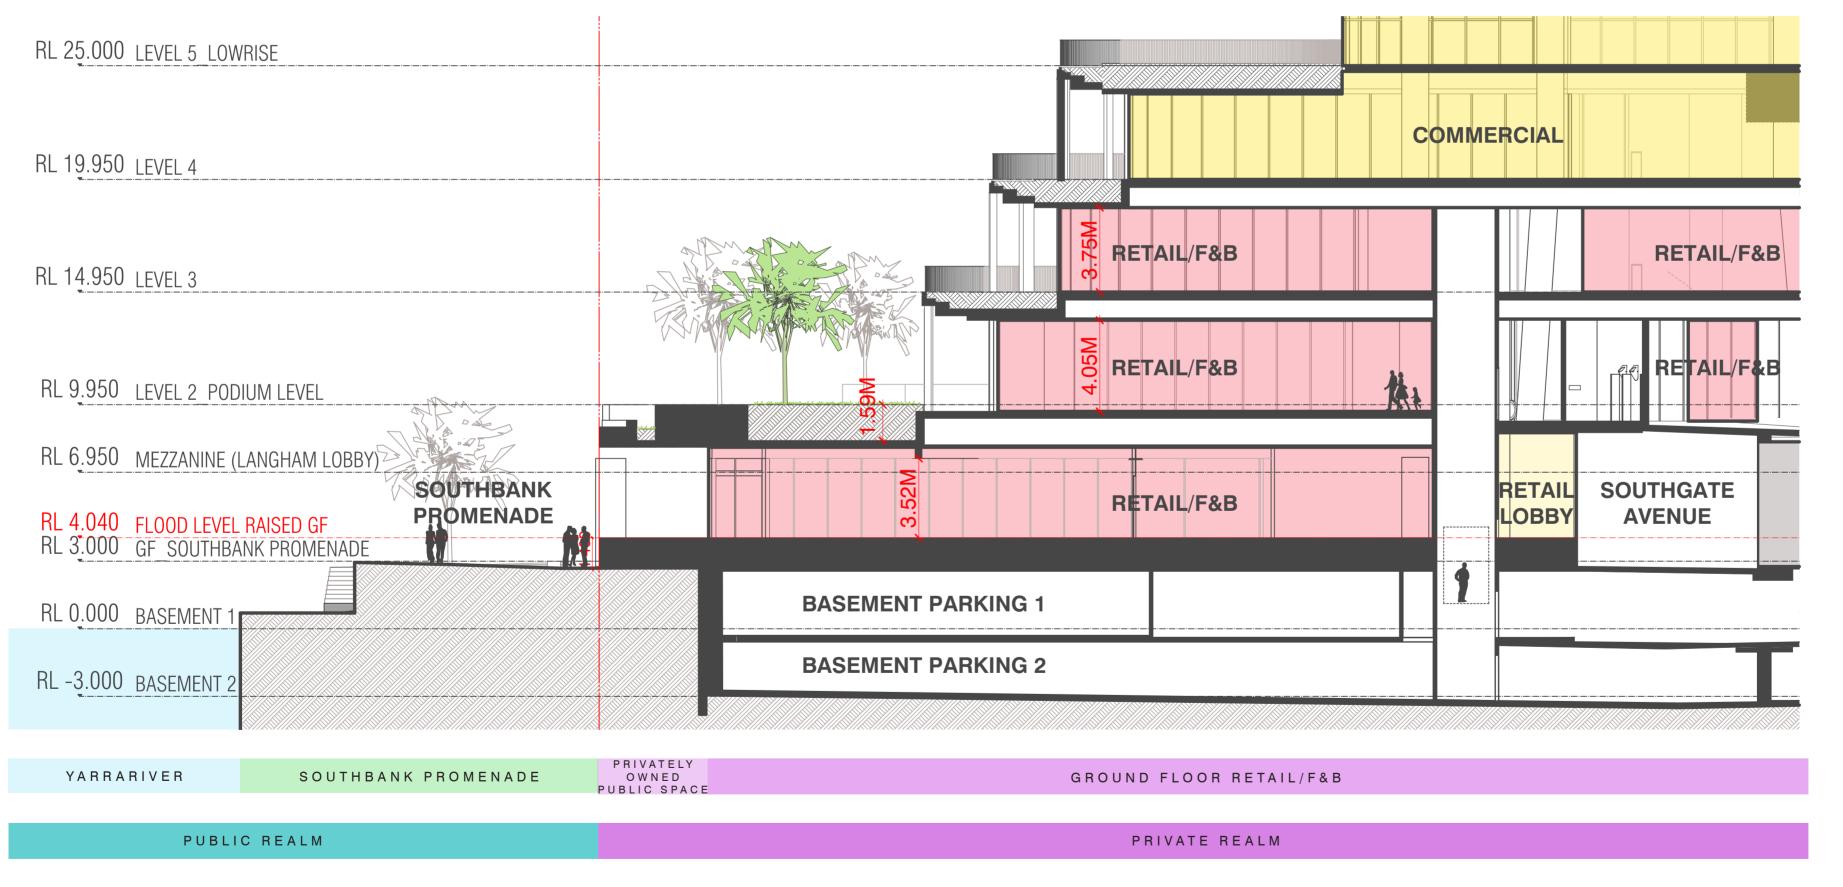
SECTION THROUGH EAST RETAIL PODIUM
